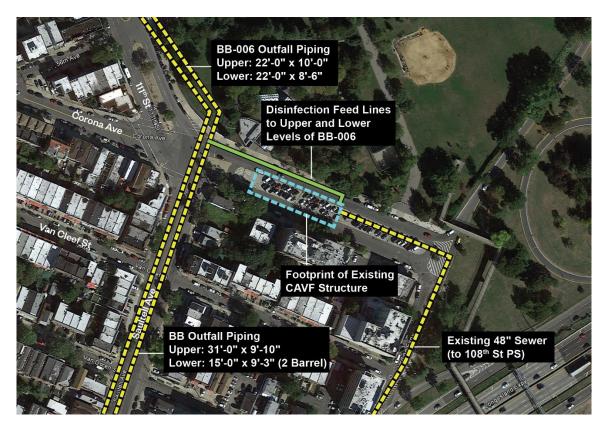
Alternative 9-1 – Retrofit of CAVF for Disinfection of Outfall BB-006
